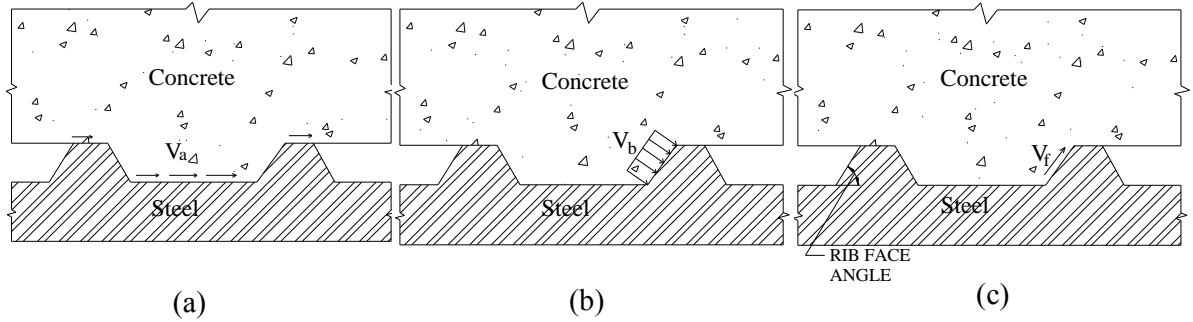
Bond mechanism of deformed reinforcement in concrete due to (a) adhesion, (b) bearing and (c) friction.
